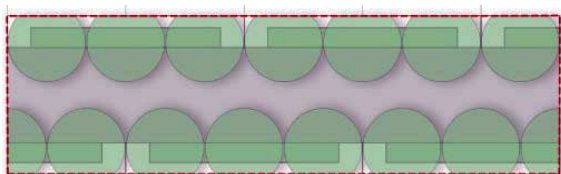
Typical new 20 m wide street with 70% canopy cover, with underground power, 10-m wide trees and 15 m wide adjoining lot widths.
